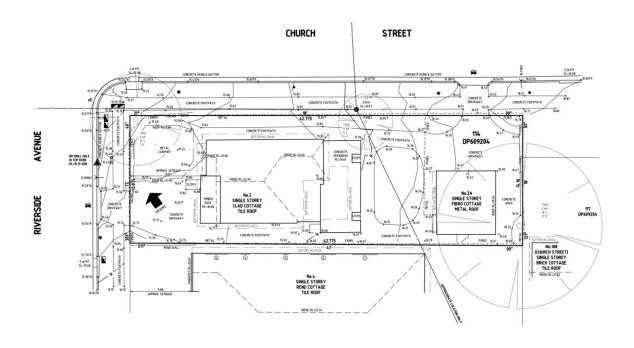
Pre- Developed Site Plan Source: Site Survey by Terralinks (Dated 10.06.2021; Job No.6233)
